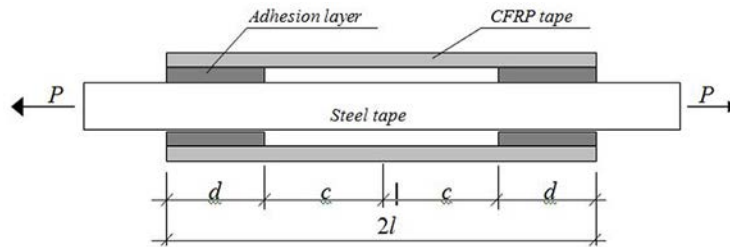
Continuous tension element. P – additional tension applied after reinforcement
